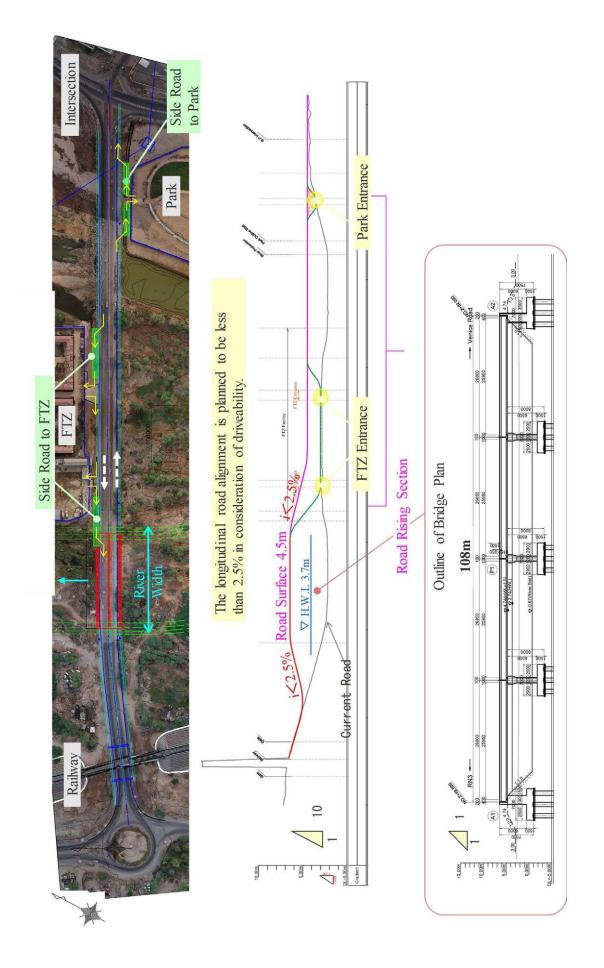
Outline Drawing of the Countermeasures (Alternative 2: Sub-stream Improvement)
